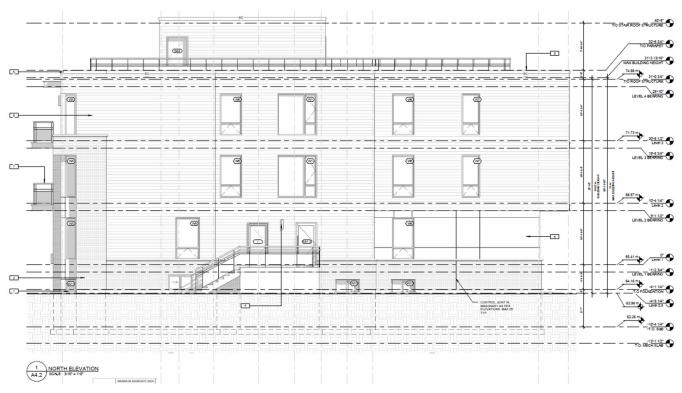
North Elevation, showing Secondary Access to the Proposed Development
